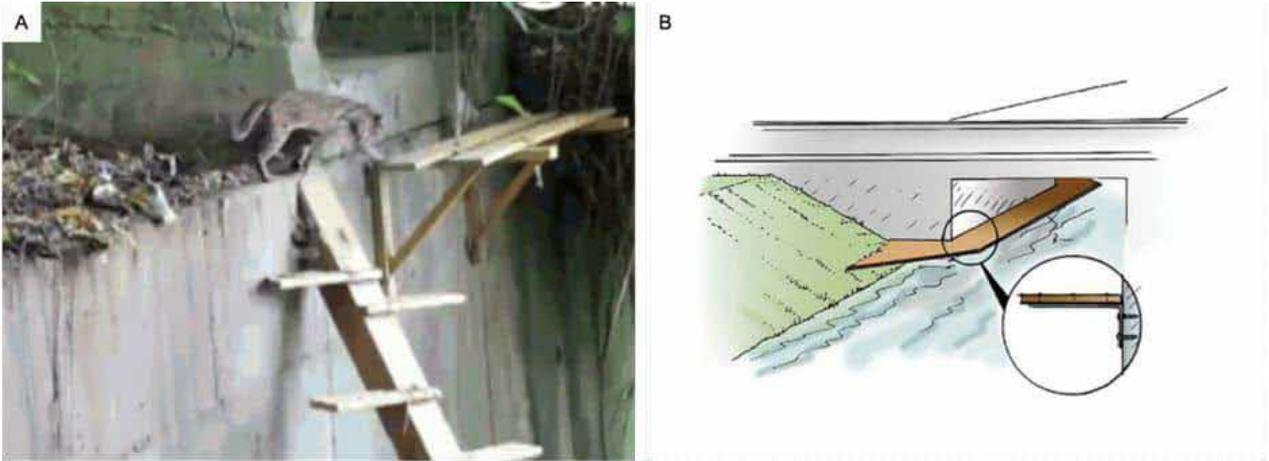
Examples of installations on canal walls to facilitate wildlife movement. (A) Ladder; (B) Elevated walkway above high-water mark (Kruidering et al., 2005; AECOM 2024)
